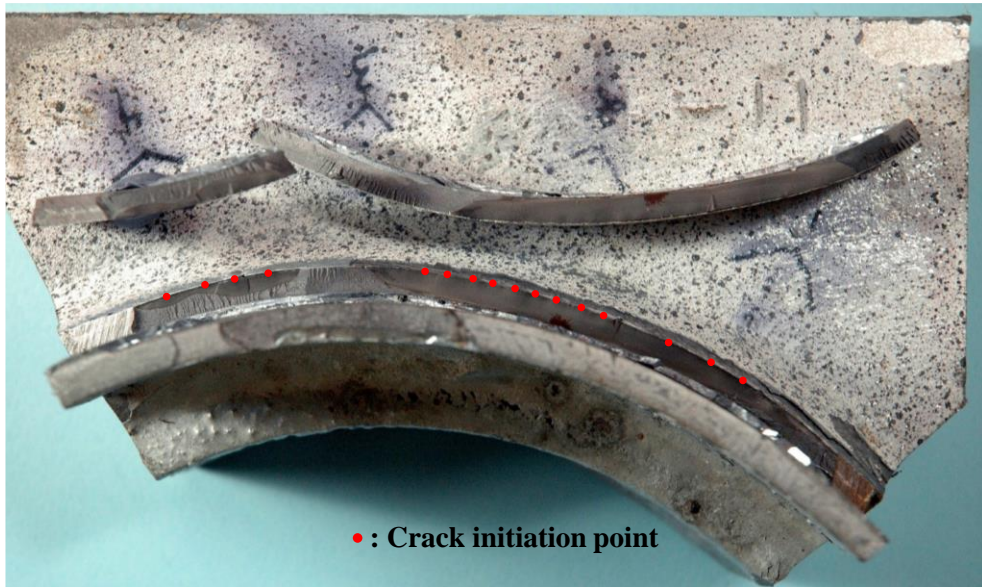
Fatigue fracture surface and identified crack initiation points in Type III-1 Arm
